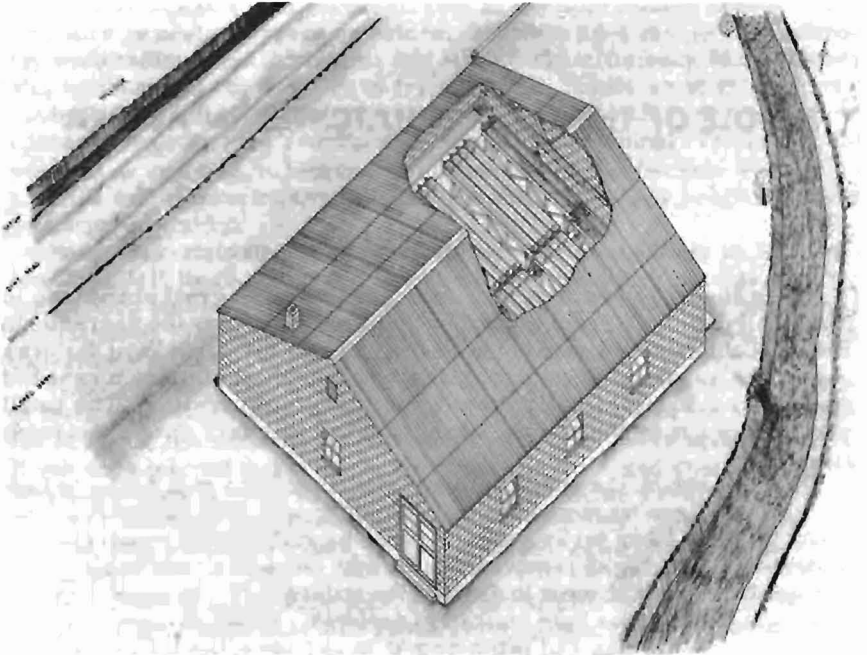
FIRE LAKE HATCHERY LOCATED NEAR ANCHORAGE.
